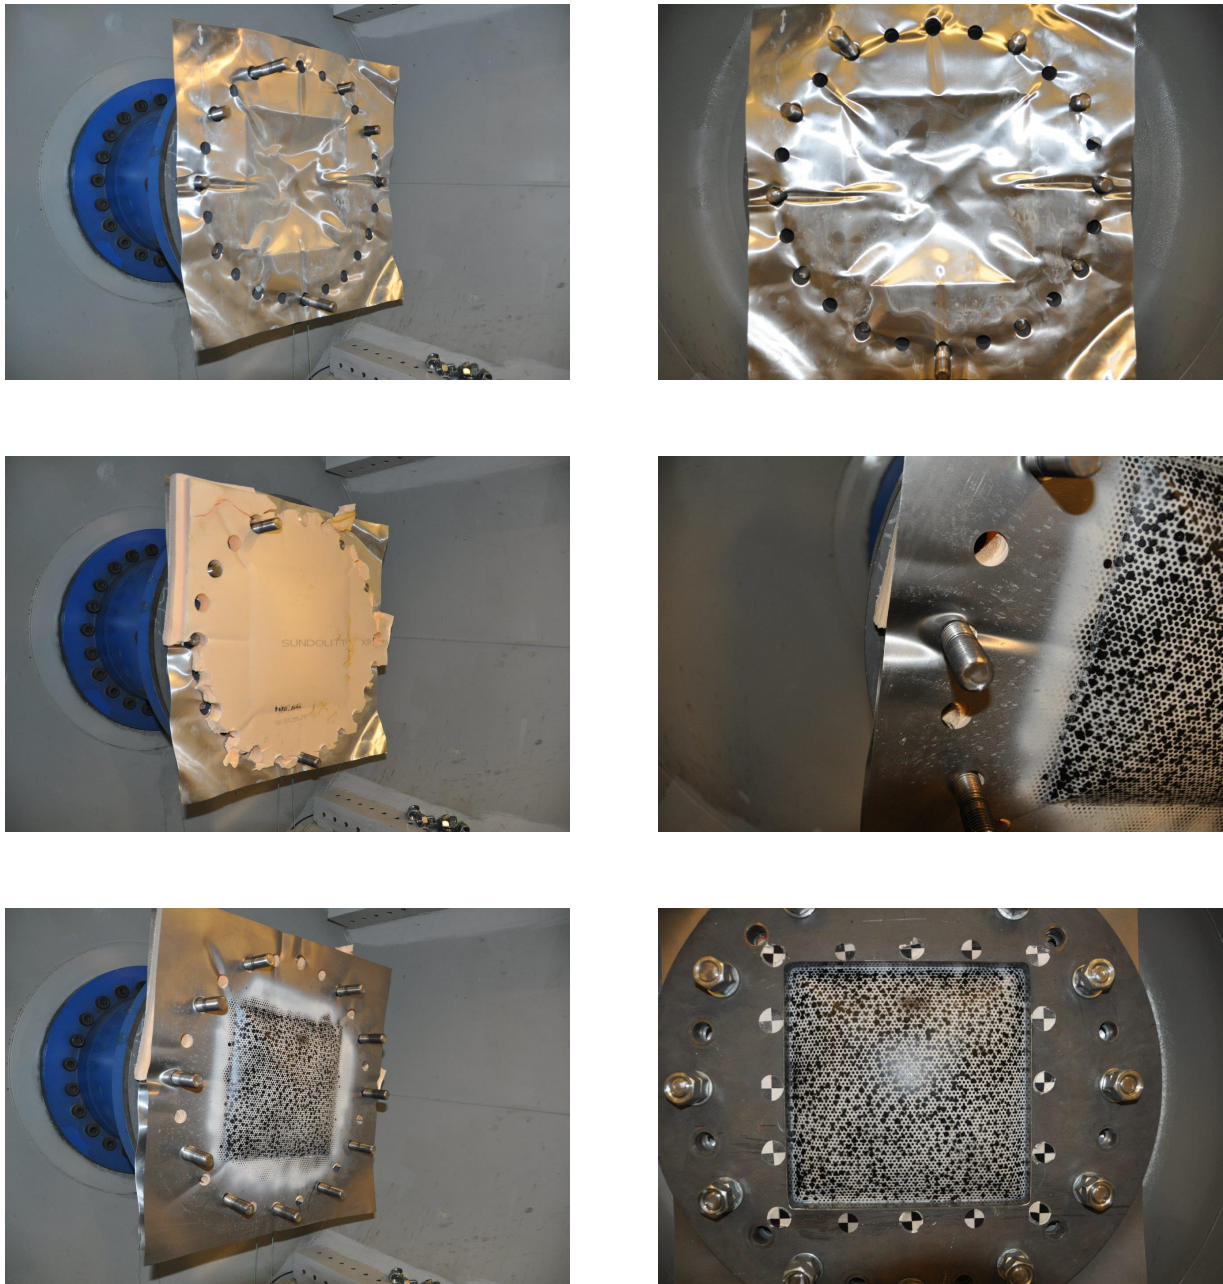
Picture of front skin (top), foam (middle left) and back skin (middle right and bottom left) deformation and the clamped component (bottom right) of sandwich panel with aluminum and steel skins and XPS-250 foam core exposed to 35 *bar* firing pressure.
